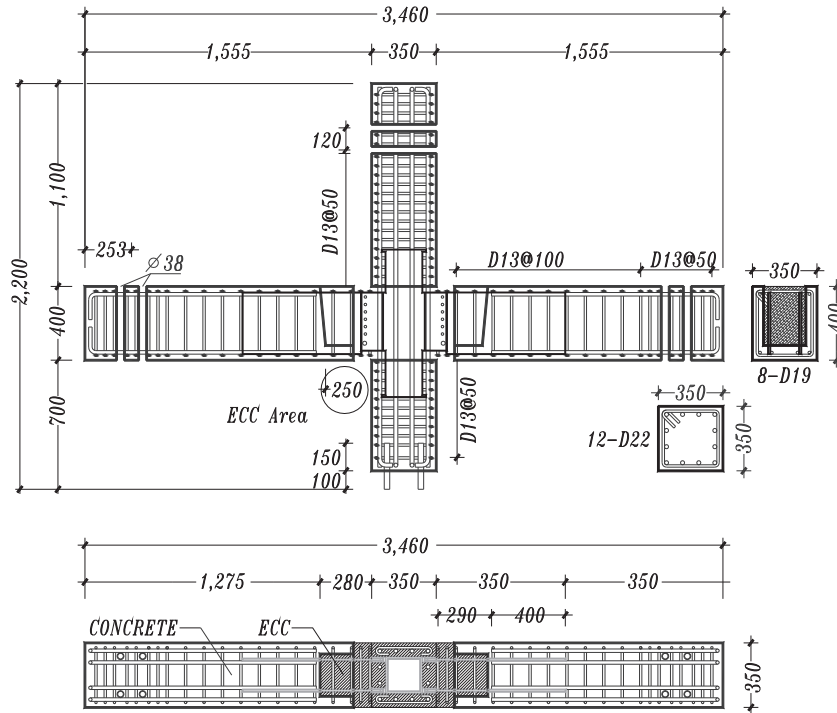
Details of PC-OH-25 Specimen (Unit: mm).
